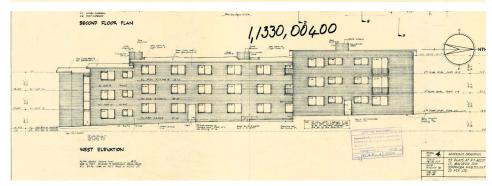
West elevation of the new OYO flats at 5-7 Ascot Street, Malvern, 1960 (SHC)
